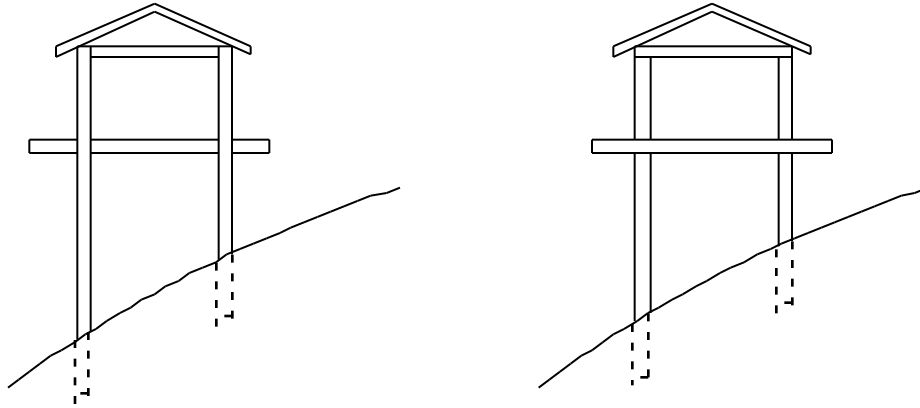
Pole Frame (left) and Platform Frame (right) Pole Construction
